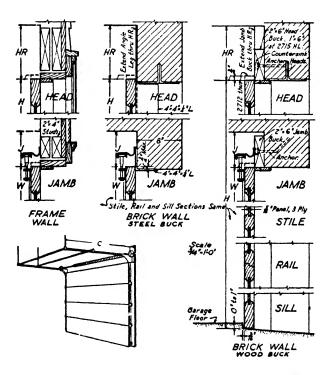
### DETAILS OF "ROLL-UP" GARAGE DOORS
